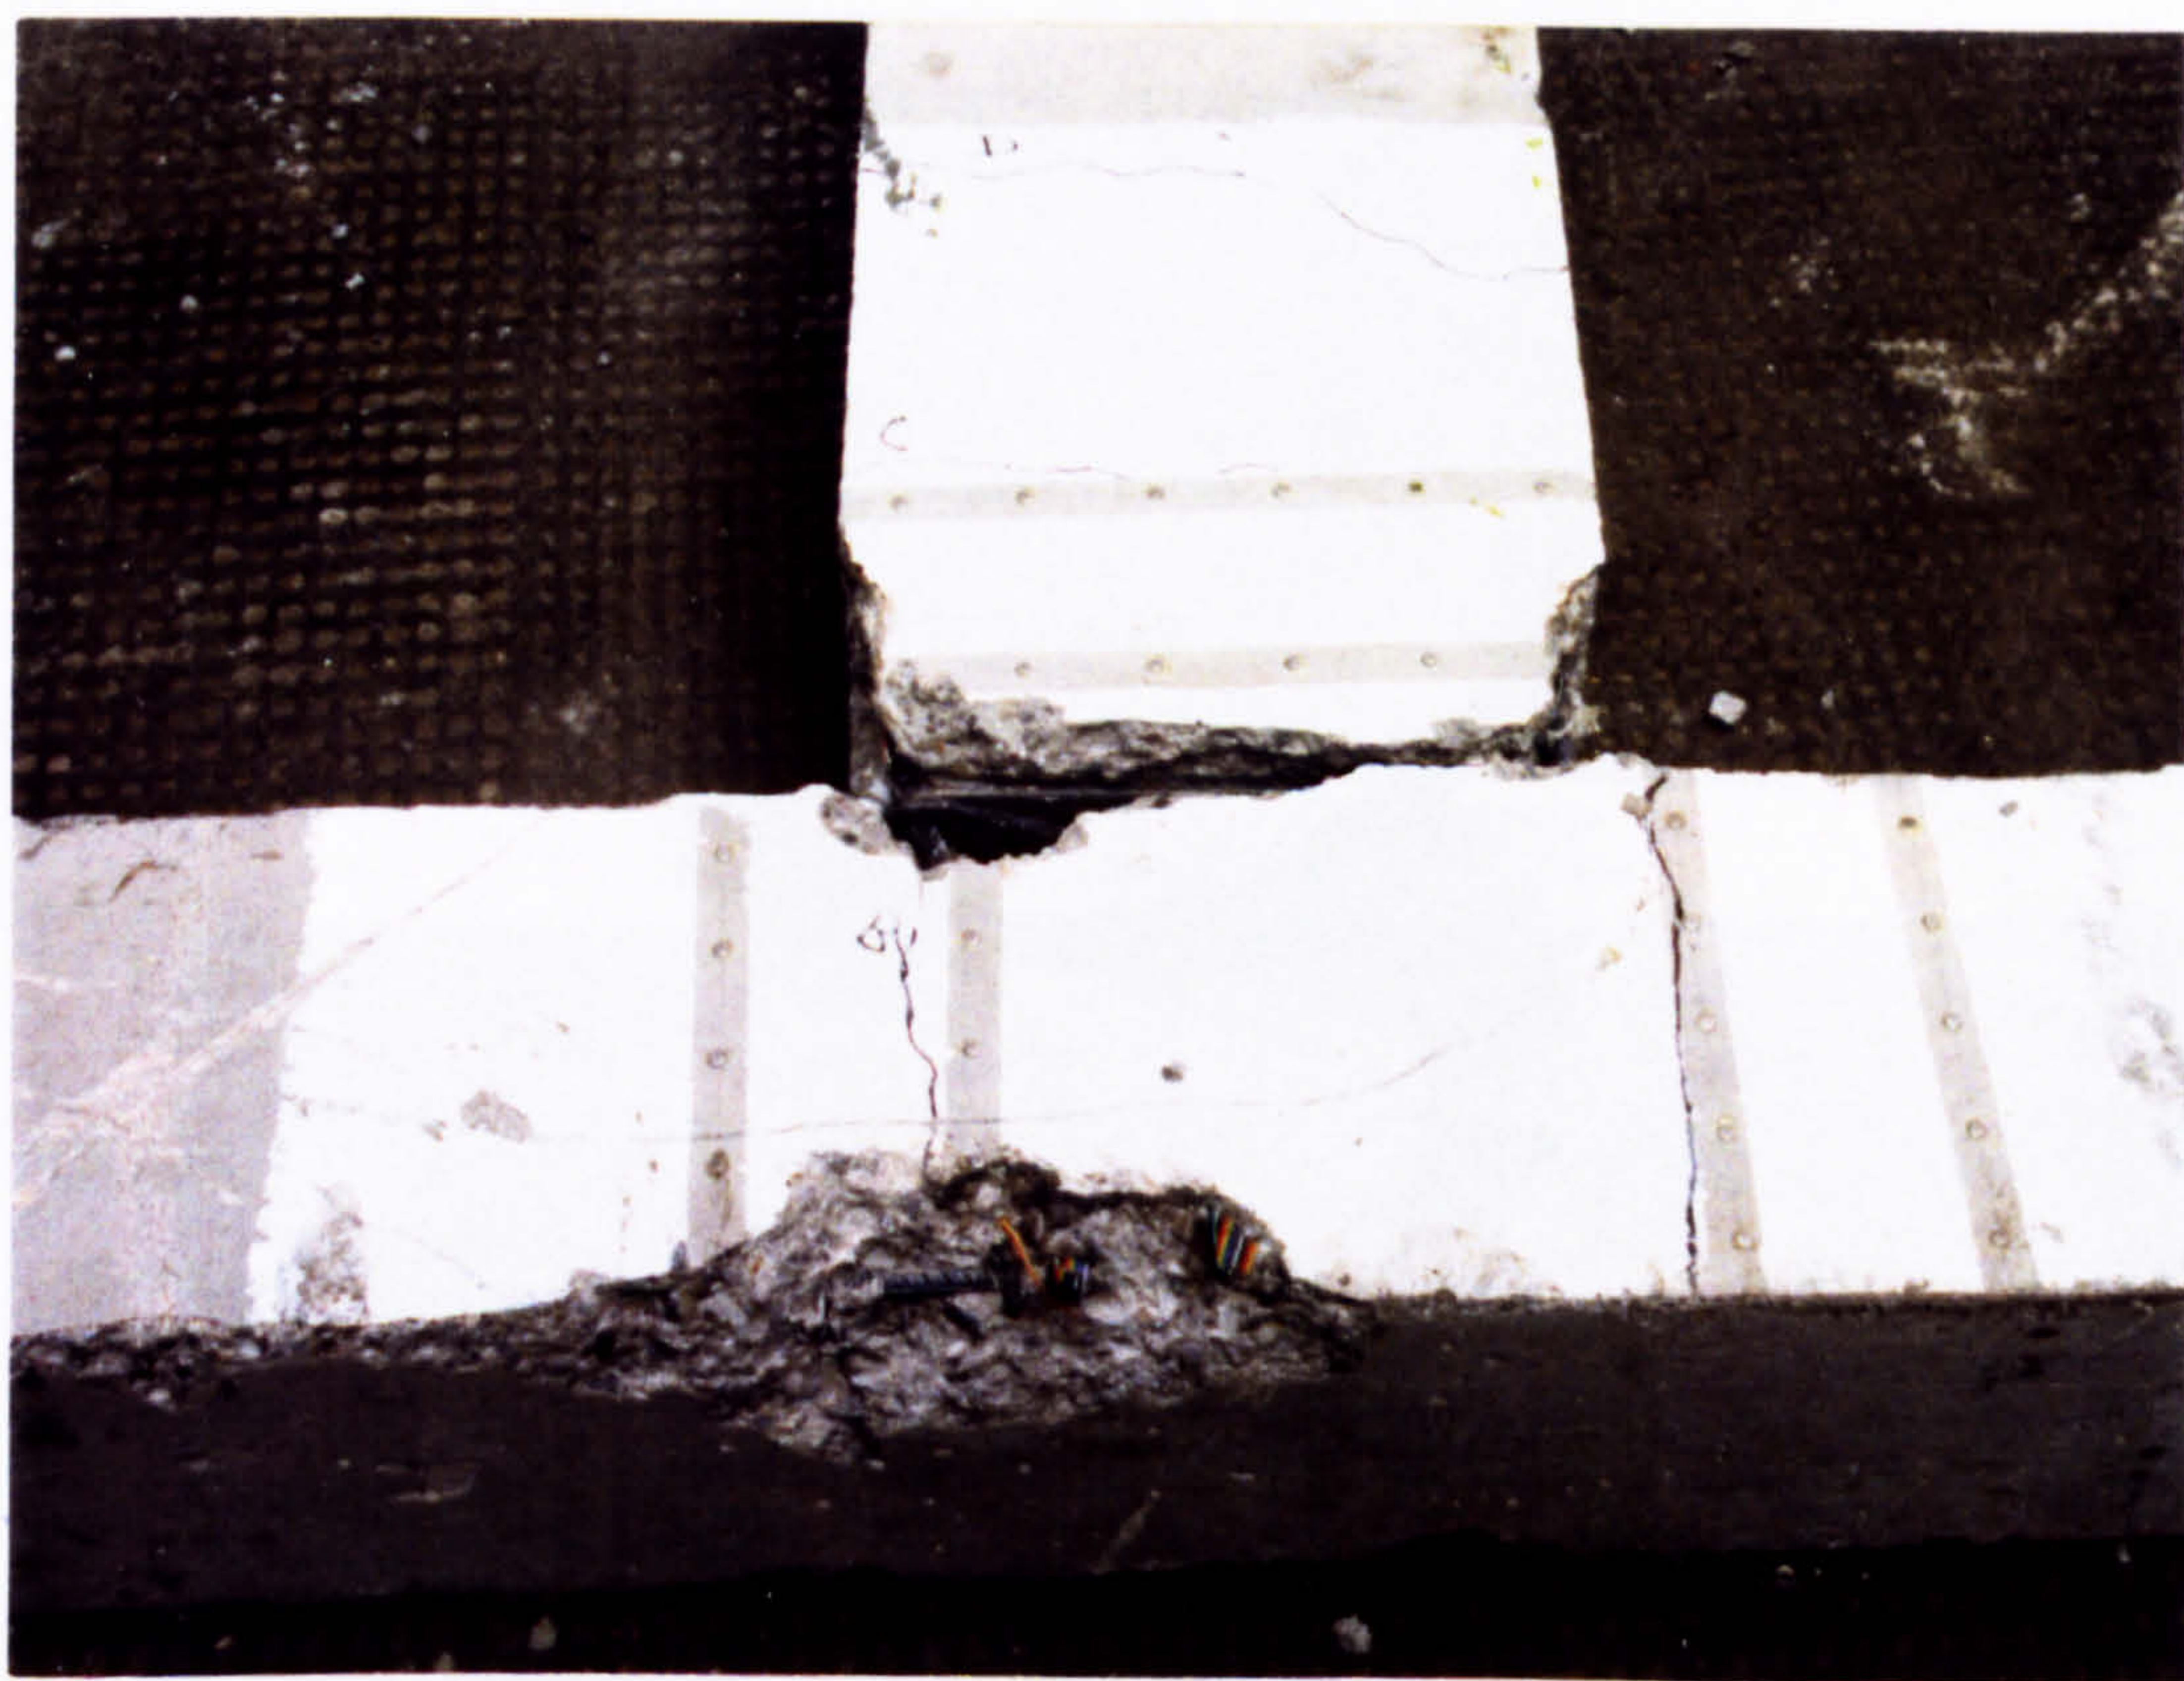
U-STIRRUPS OVERLAPPING & CRACKING PATTERN - UD2
